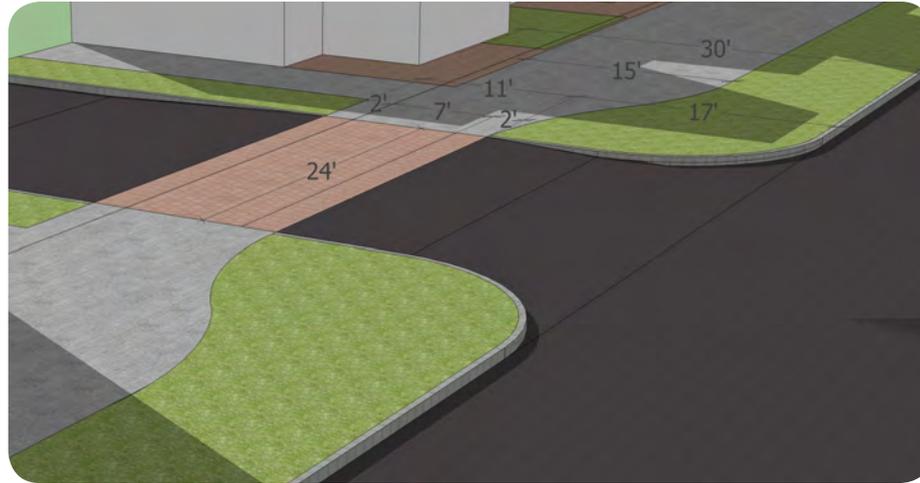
Image showing the 11-foot wide promenade moving across a drive apron. The diagram shows the colored concrete pedestrian crossing demarcating the pedestrian crossing. Notice that where possible the drive lane has been elevated to the sidewalk elevation.
